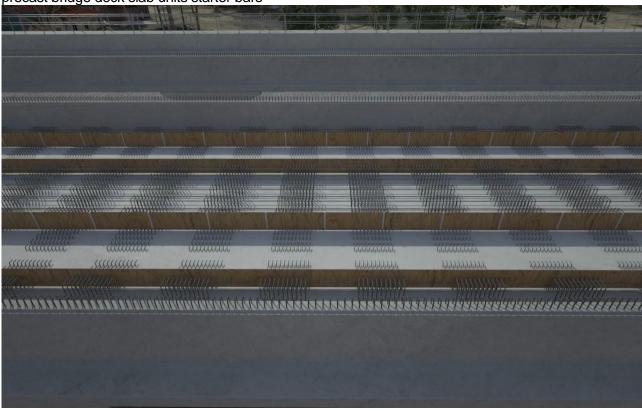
Reinforcement starter bars for the track slab and derailment kerb construction
